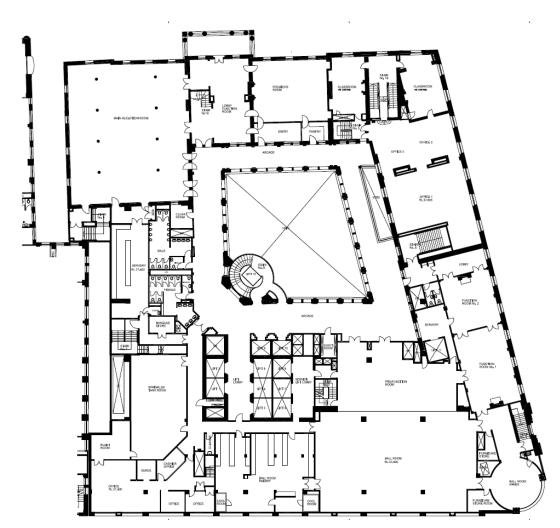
Extract of accommodation survey from 2004: First Floor Plan
